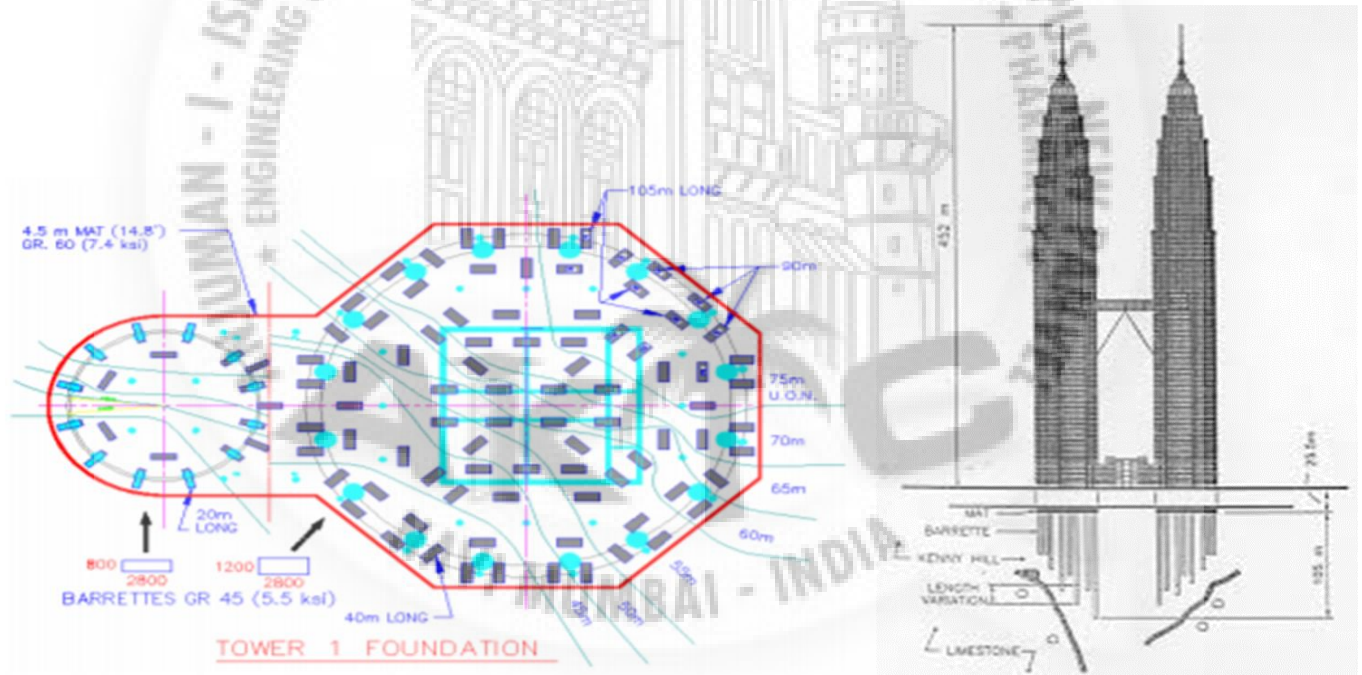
Petronas Tower Foundation (Source – CTBUH)
